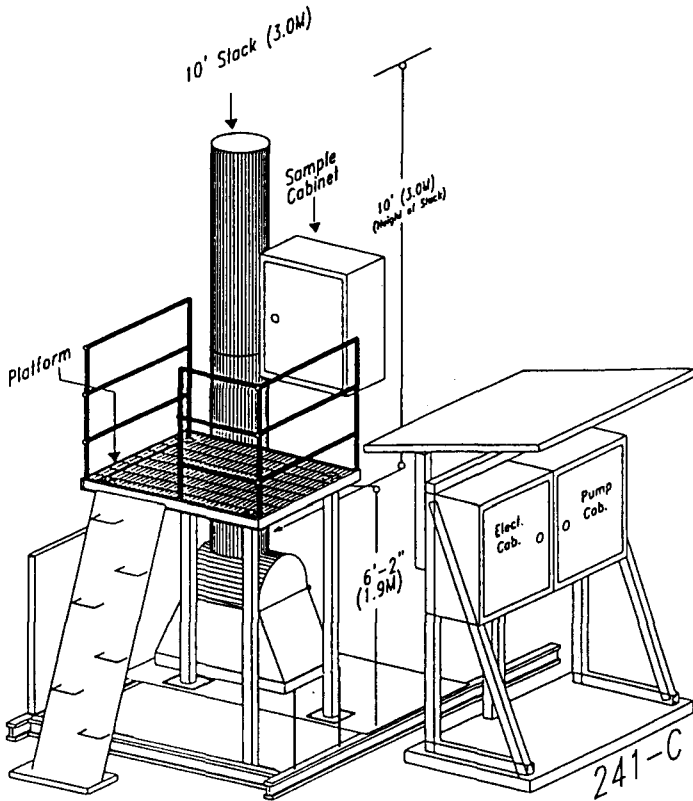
241-C-105 & -106 Exhauster - Elevation View of Upgraded Facility
